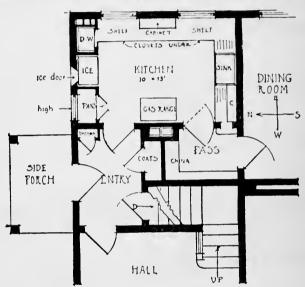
A kitchen for a suburban house, developed in accordance with the principles of good arrangement.
